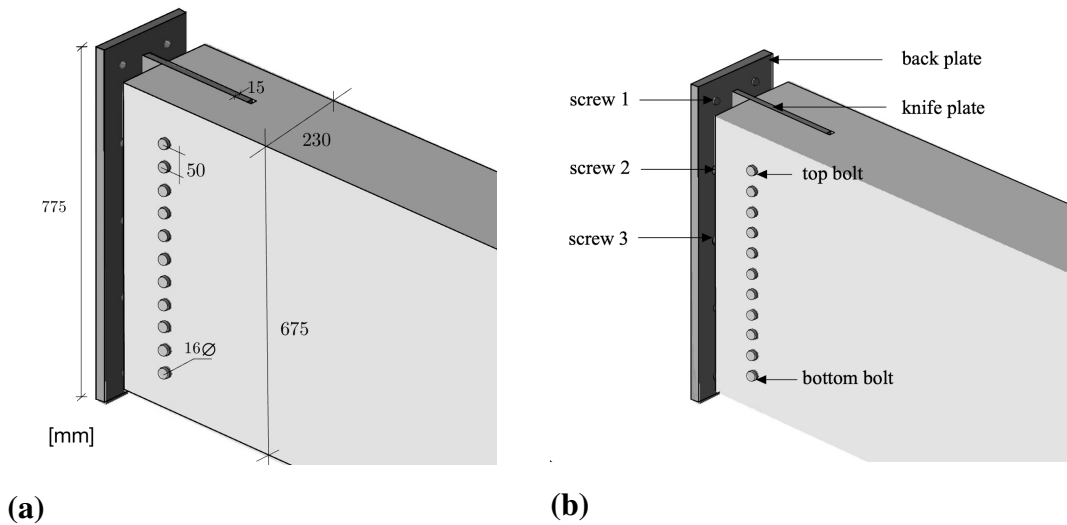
Connection layout, a) with dimensions and b) with predefined terms
